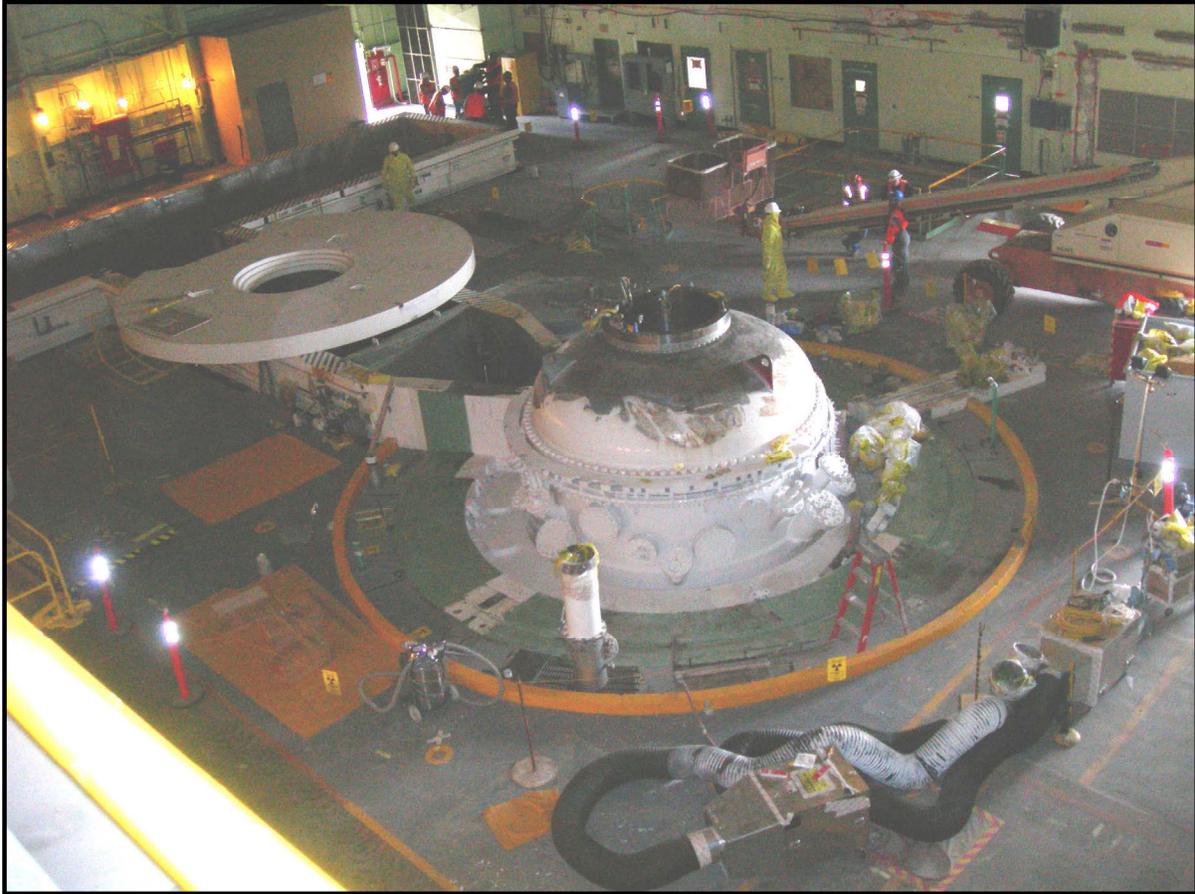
Top head of the reactor vessel after bioshield removal, showing top head and nozzles.
